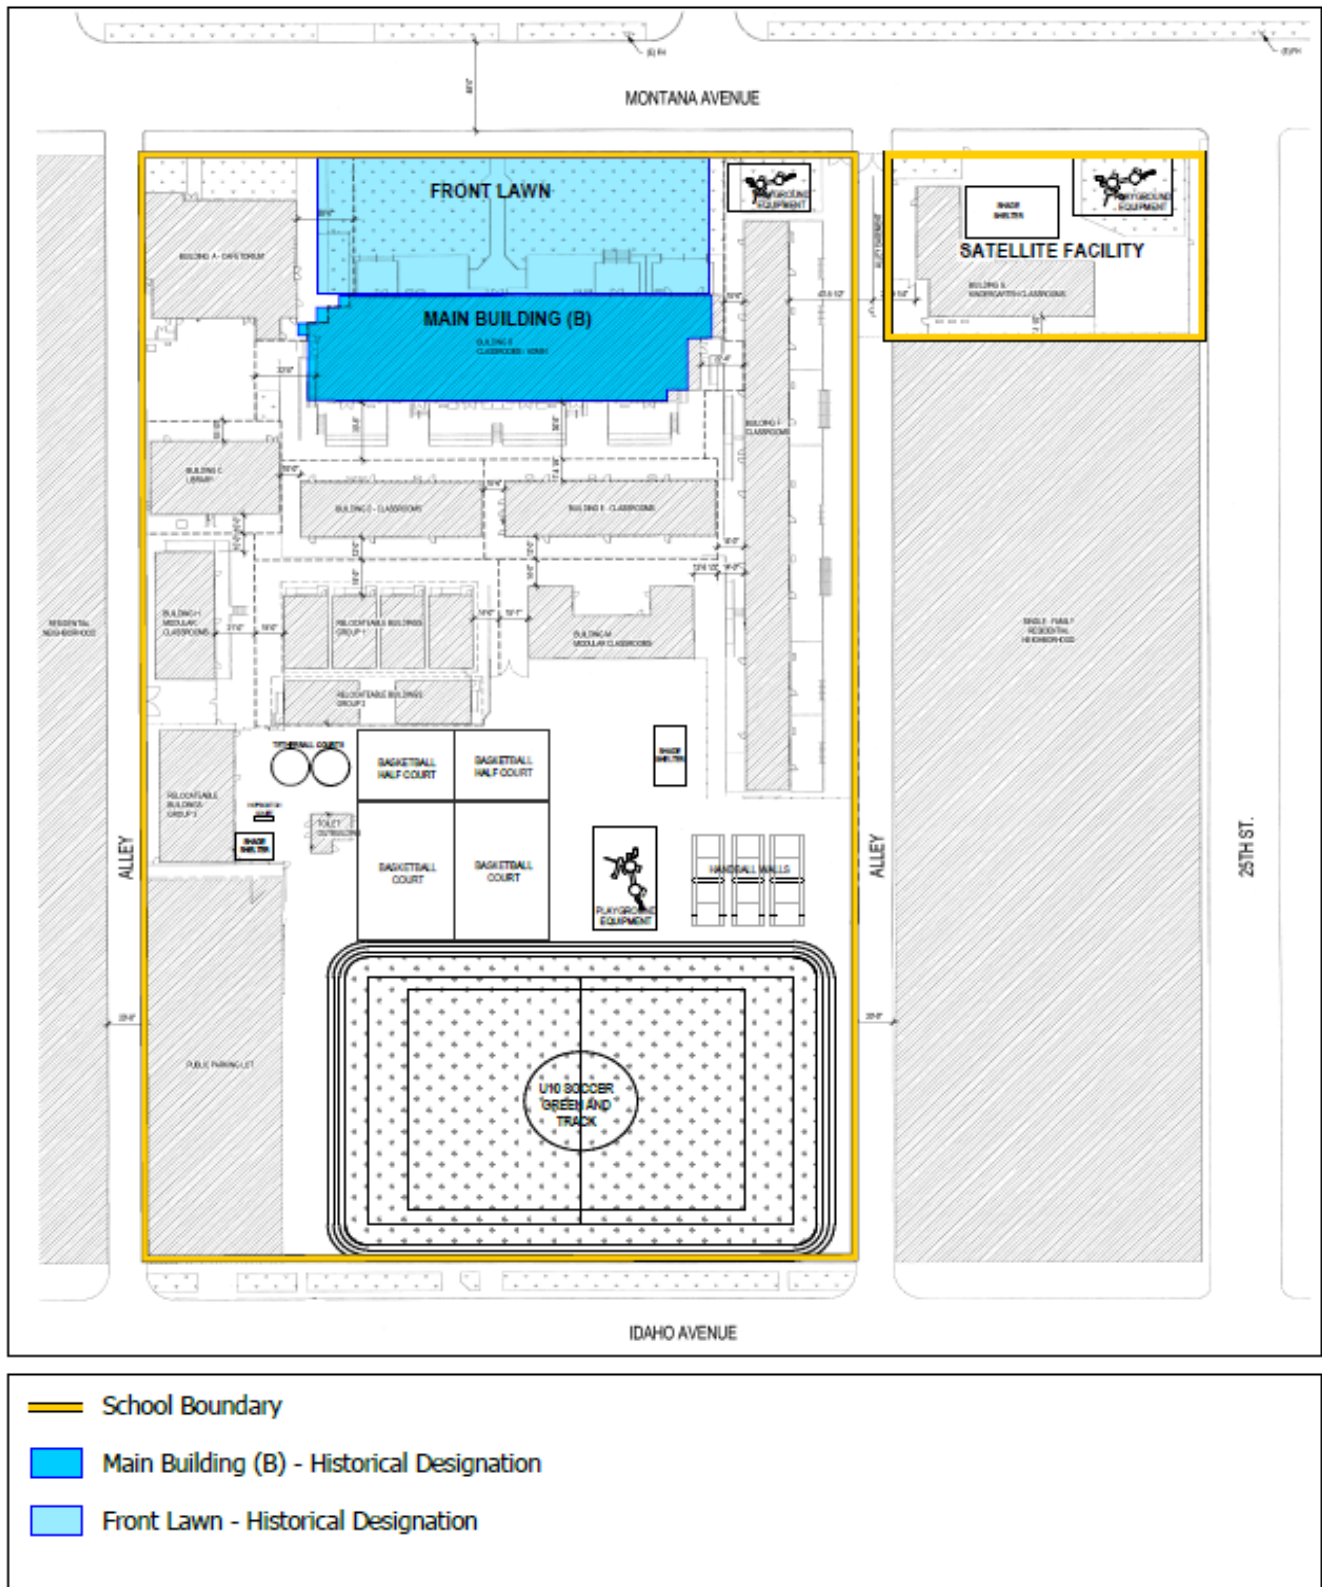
PROPOSED CAMPUS FACILITIES
